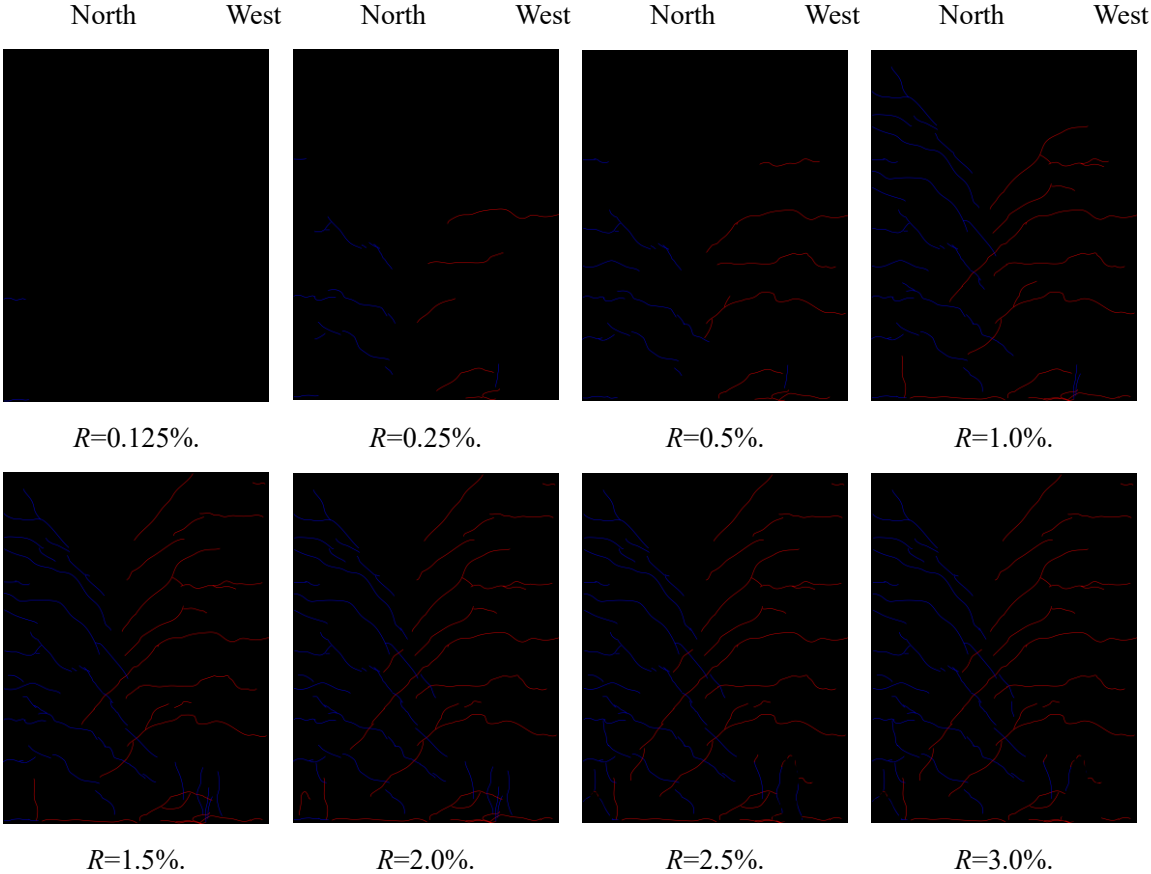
Cracks patterns observed on specimen W20-HU-073
